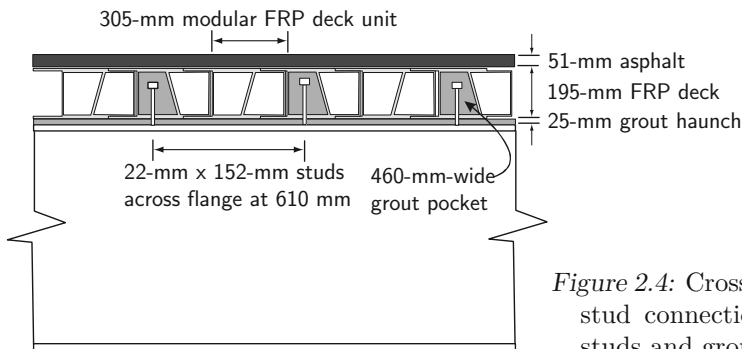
Cross section of girder with shear stud connections showing haunch, shear studs and grout pocket [THPR04]
